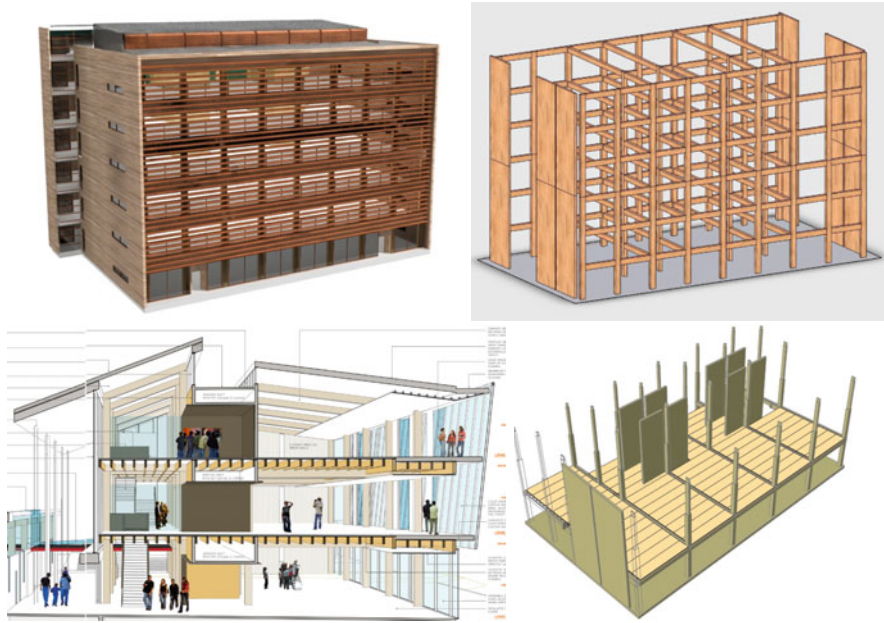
Architectural rendering and structural skeleton of (*top*): a case-study 6-story post-tensioned timber building (virtual re-design of real concrete building at UoCanterbury, photo courtesy of T. Smith); (*bottom*): World's first Pres-Lam system application (Nelson Marborough Inst. of Technology, Nelson, NZ, photo courtesy of Irving-Smith-Jack architects and Aurecon)
